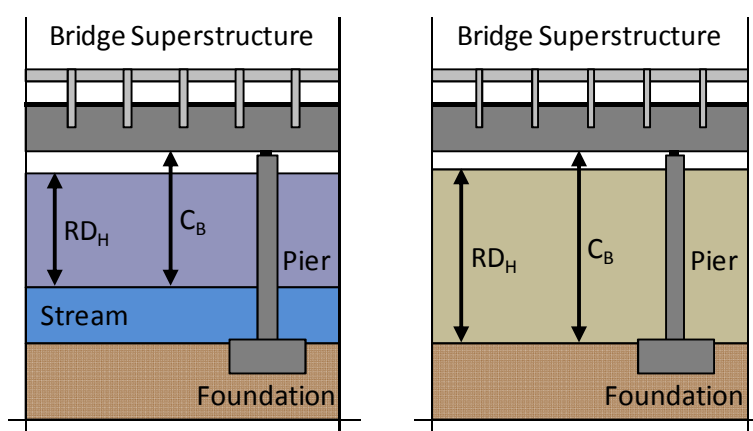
Assessing if hazard running height surpasses bridge clearance for a) a bridge crossing a stream and b) a bridge crossing uneven ground.
